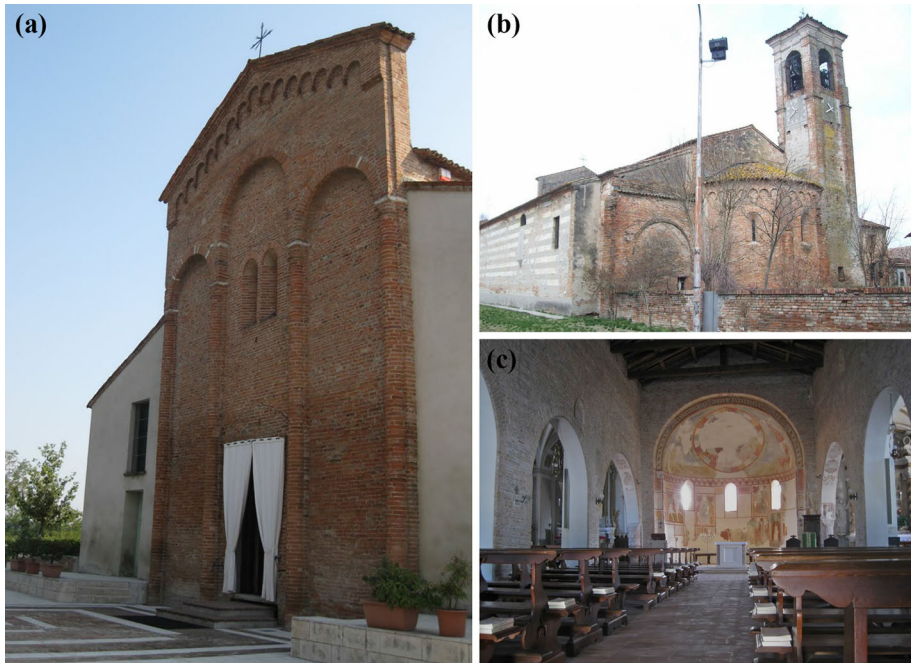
San Fiorentino Martire church: a main façade, b apse and bell tower, c inner view of the church toward the apse
